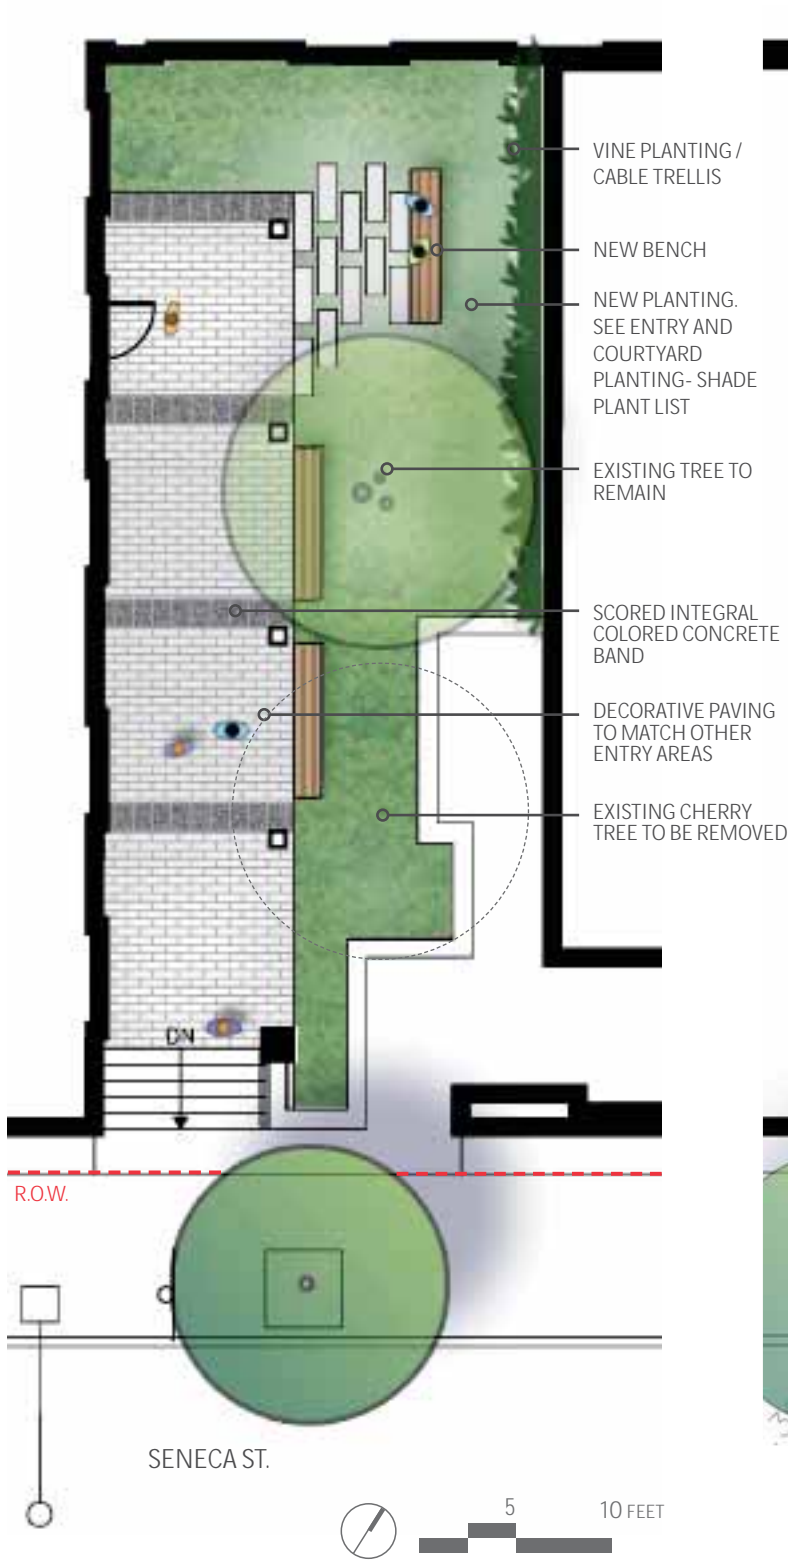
BLACKFORD HALL ENTRY - PROPOSED PLAN
